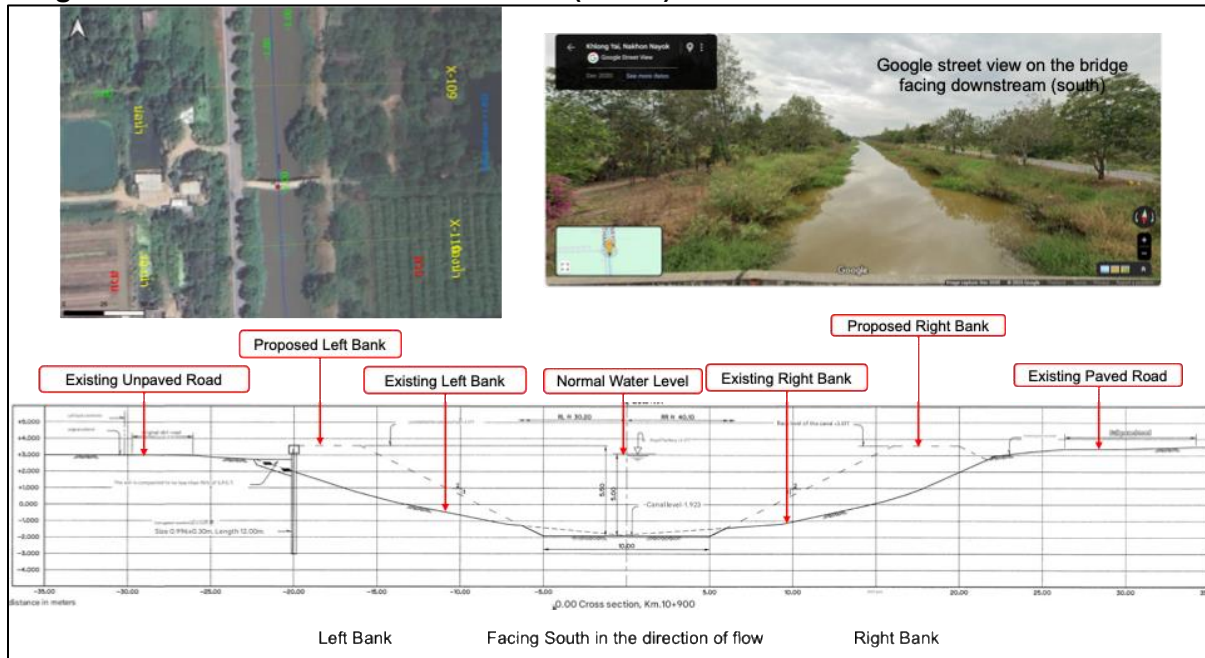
Cross-Section 2 in Canal 14 (Part 2) with Sheet Pile Wall on Both Sides
